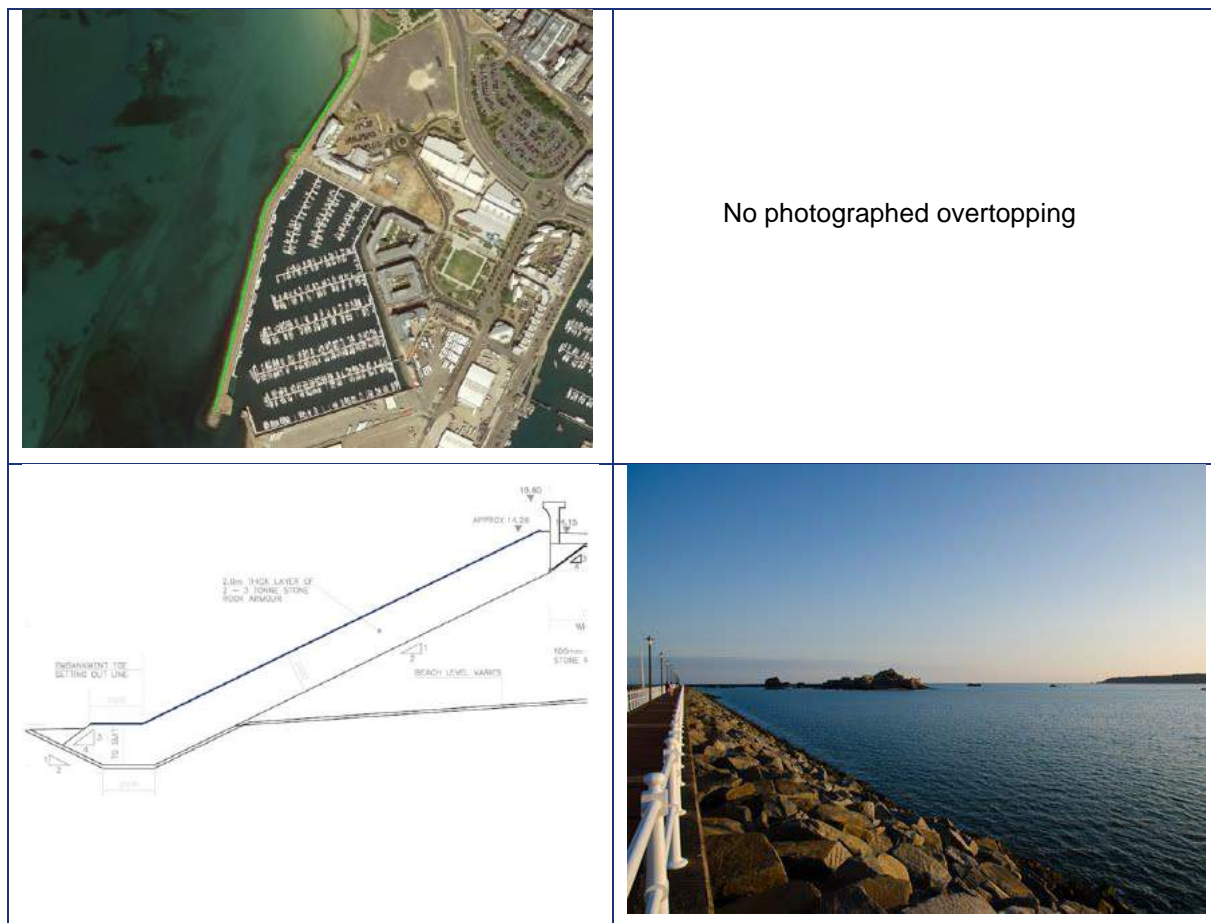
Structure and overtopping evidence at Structure 4: Rock armour revetment
